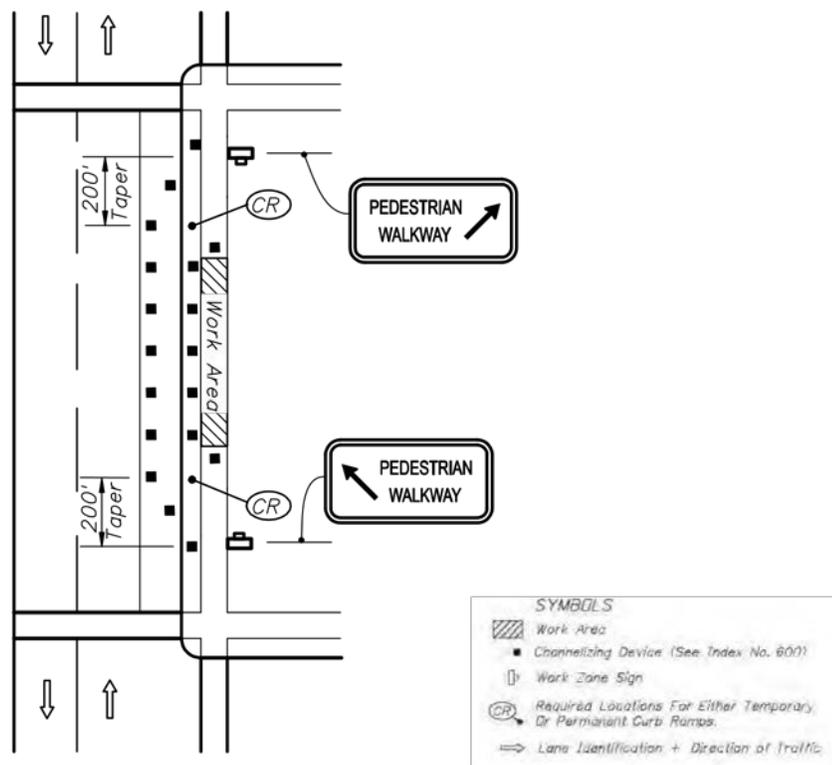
Florida standard 660: Pedestrian Control For Closure of Sidewalks - Mid-Block Sidewalk Closure with Temporary Walkway
